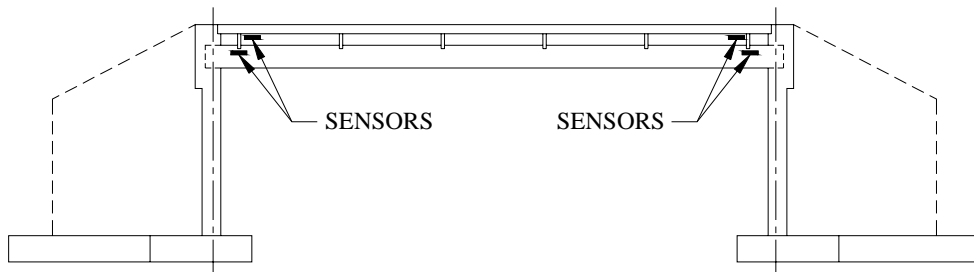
Section 1 of the Instrumentation Plan/Layout
